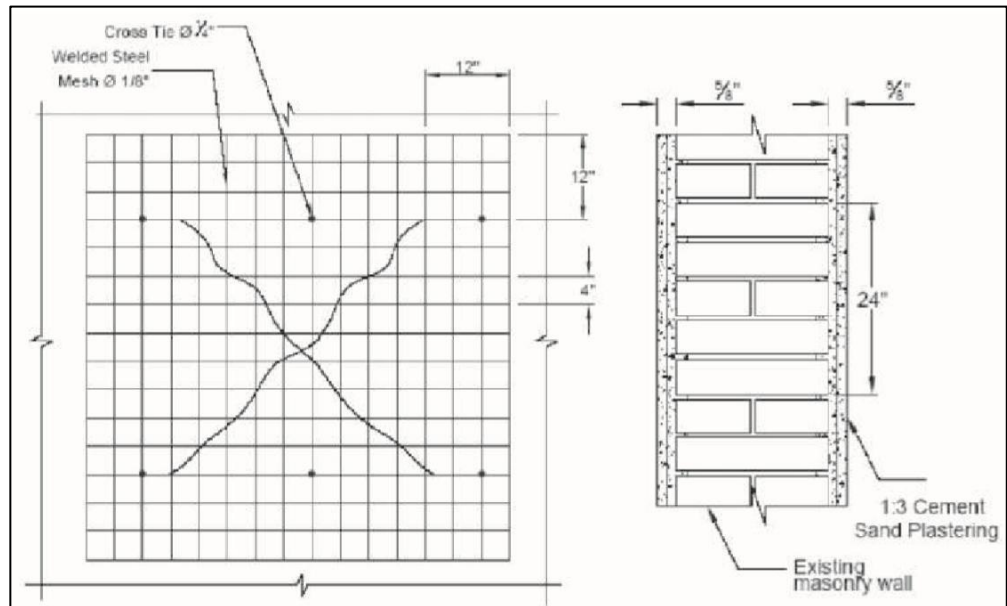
Repair of heavily cracked brick/block masonry walls with reinforced cement jacketing
